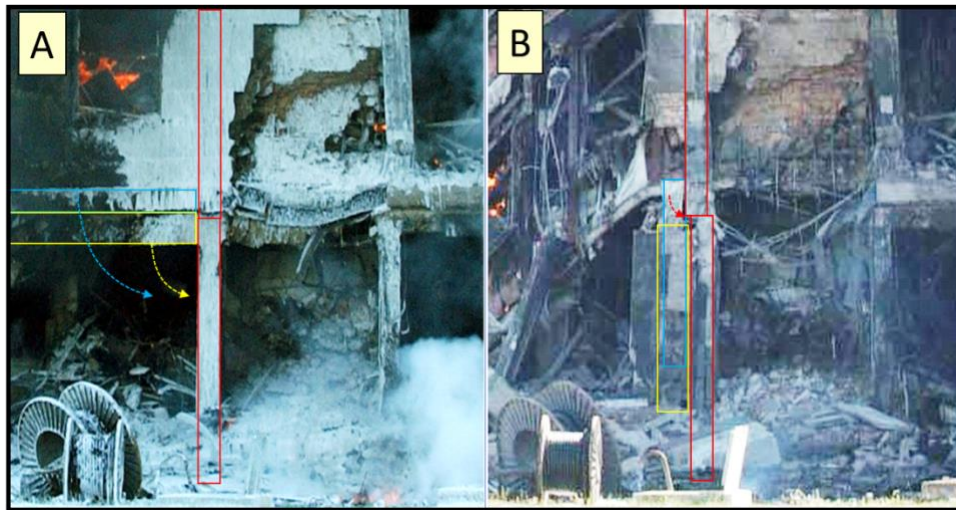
Pre collapse damage to Column 18 (left) and post collapse damage (right) showing that the beam (yellow) and portion of the floor slab (blue) between Columns 17 and 18 rotated down and pried Column 18 (red) to the south.
